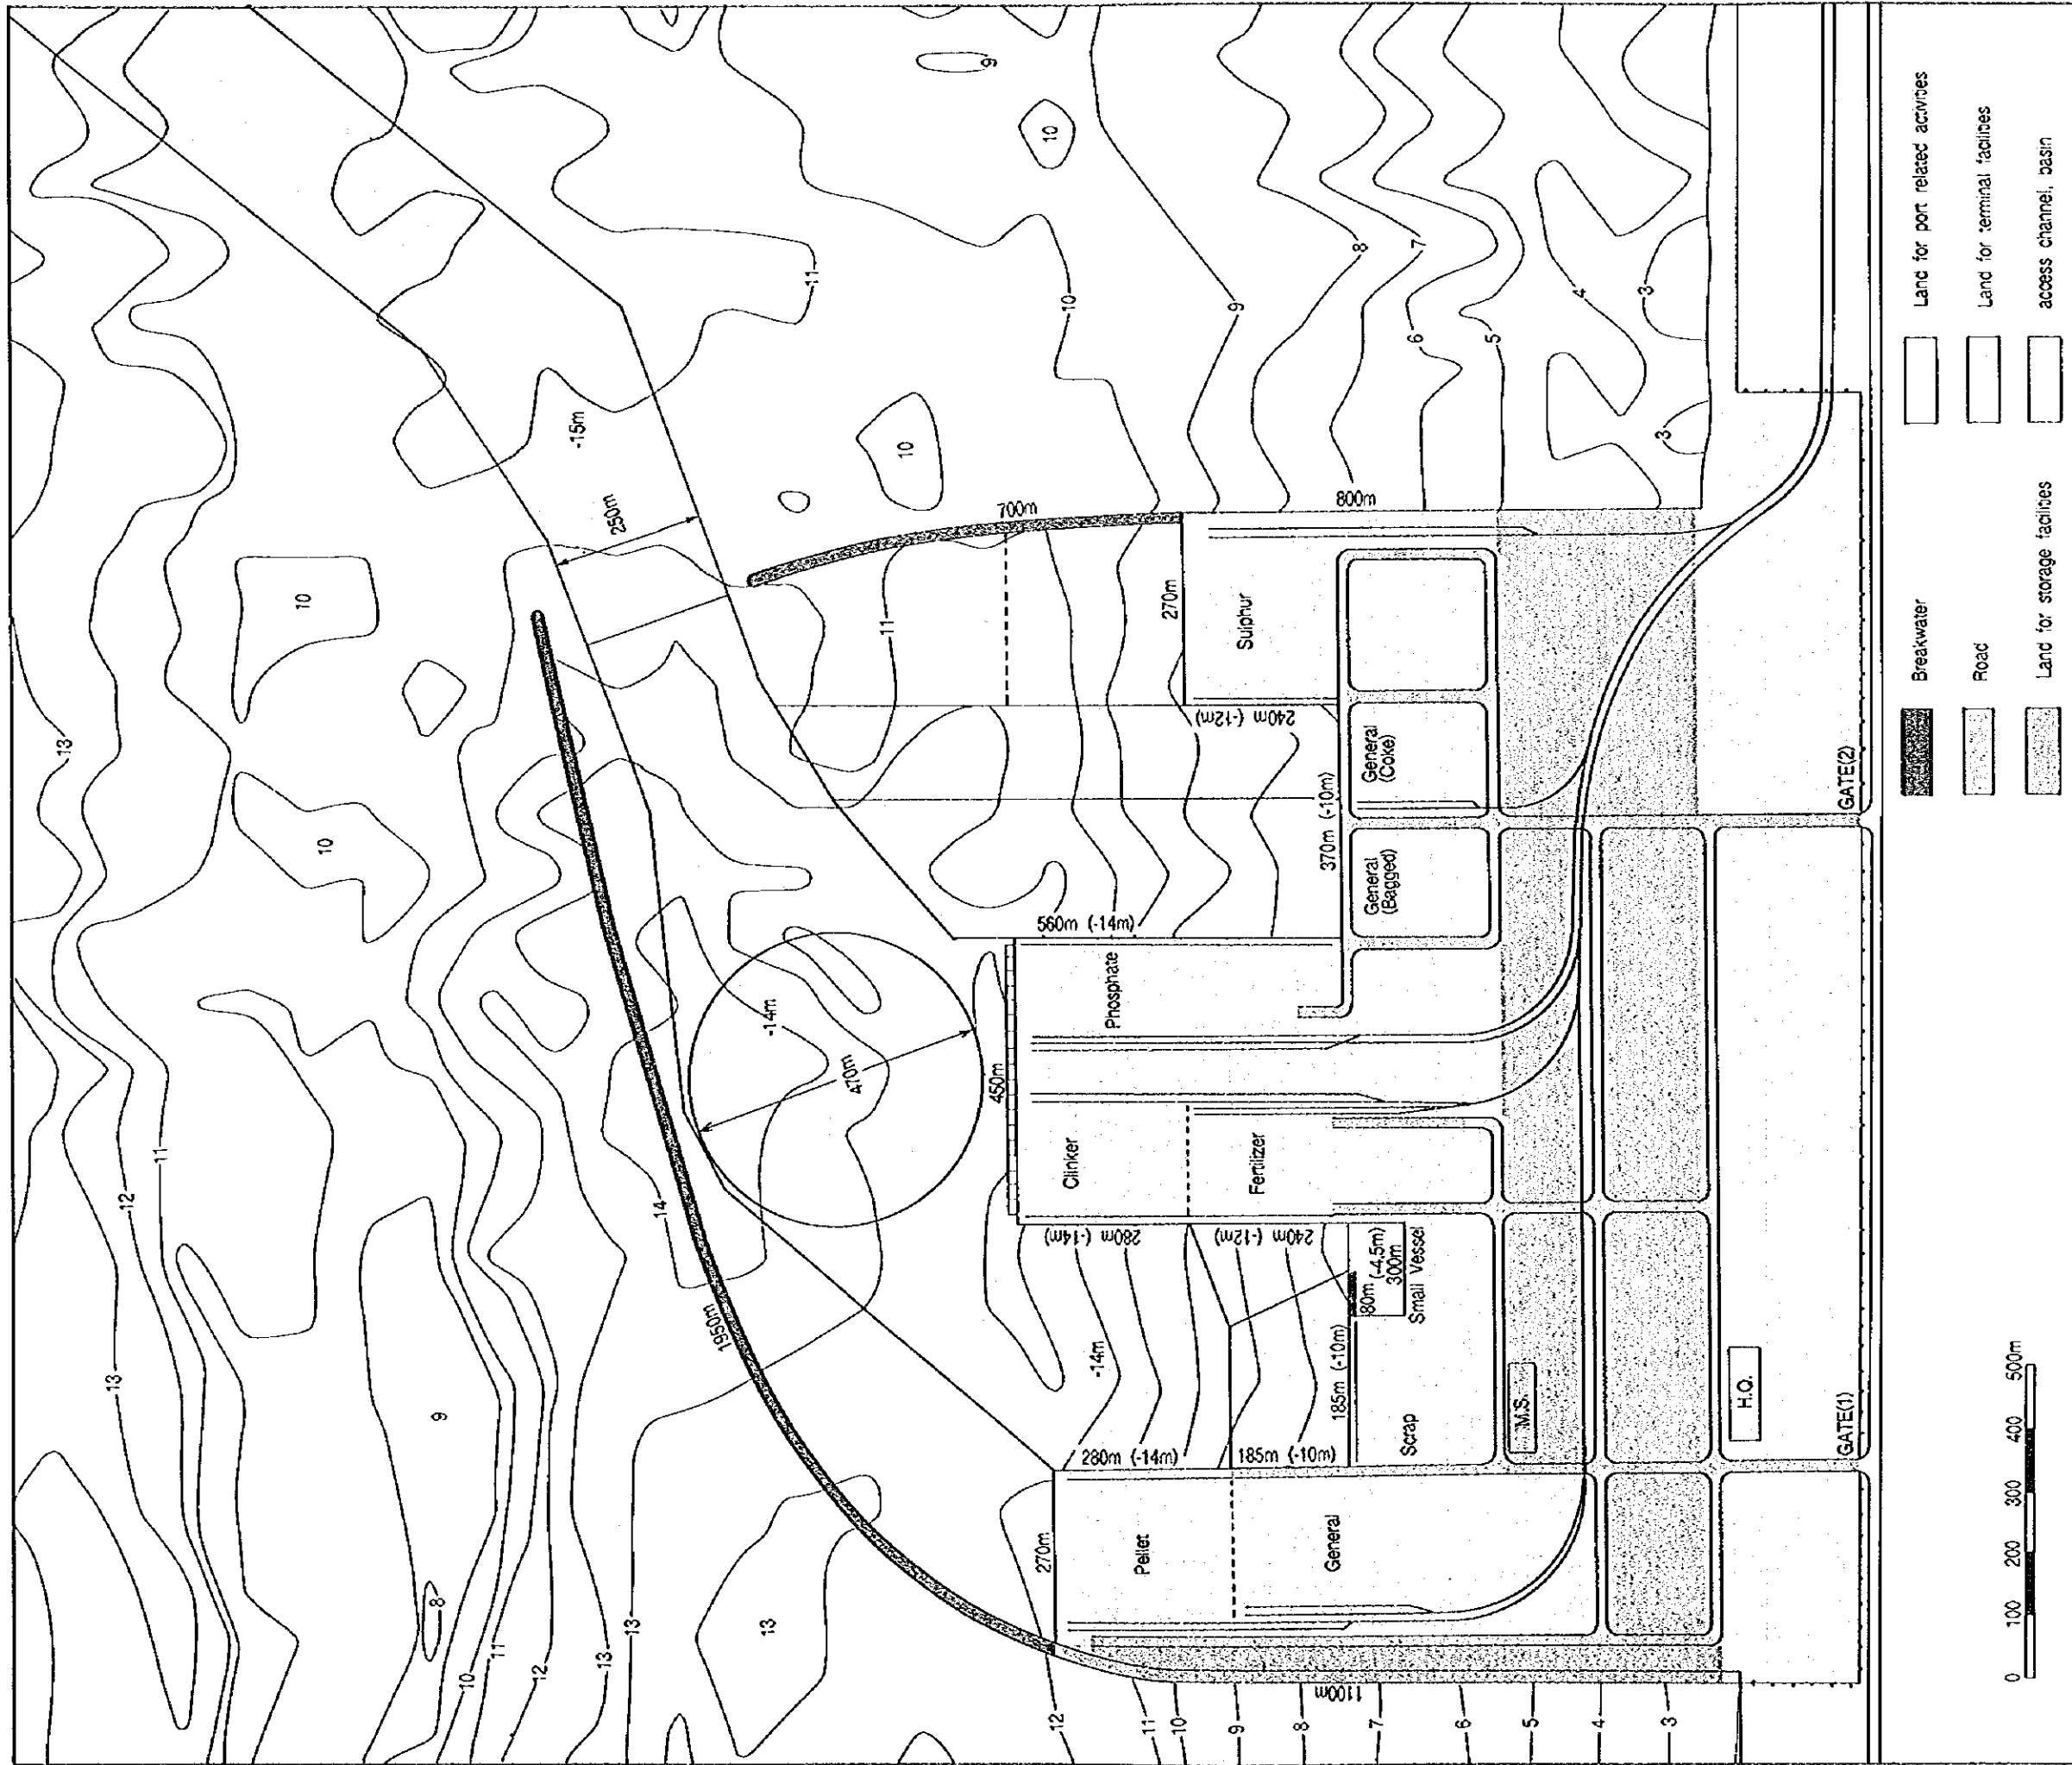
Master Plan of the NEW PORT - Alternative (3) -
